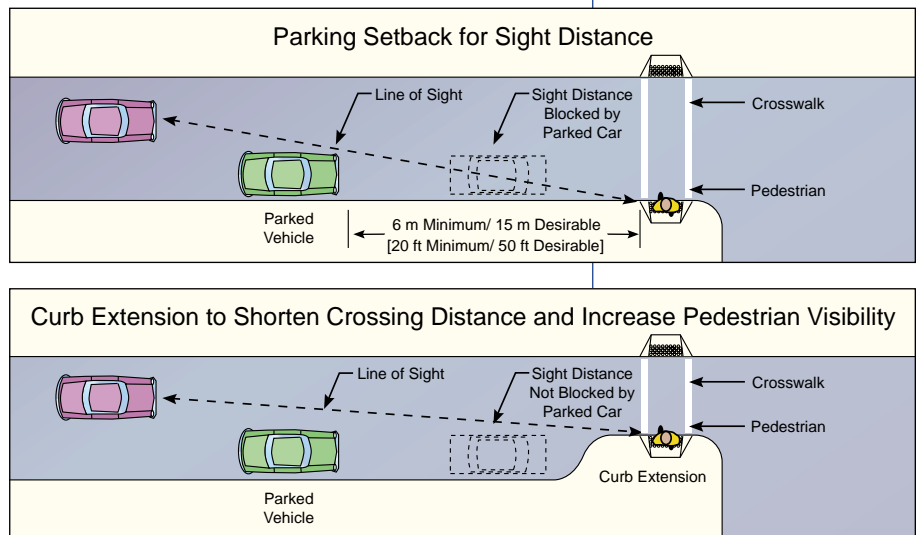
Recommended Parking Setback and/or Curb Extension Installation (18). ©1998, Institute of Transportation Engineers. Used by permission.
